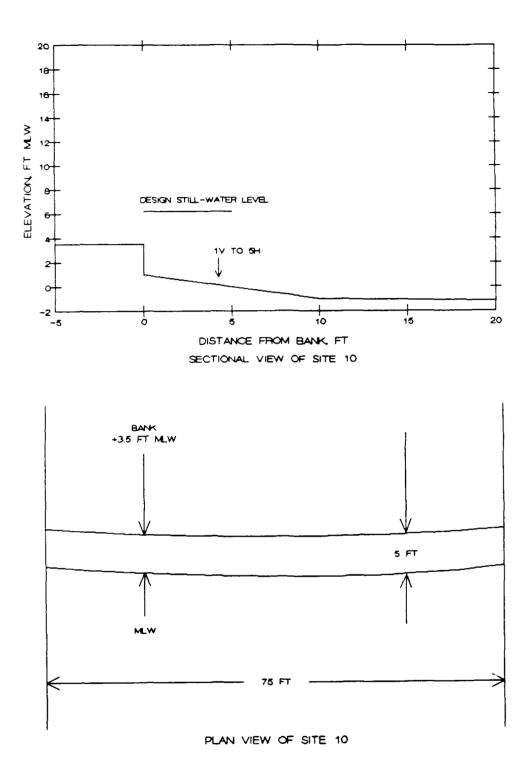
SECTIONAL AND PLAN VIEWS OF SITE 10
